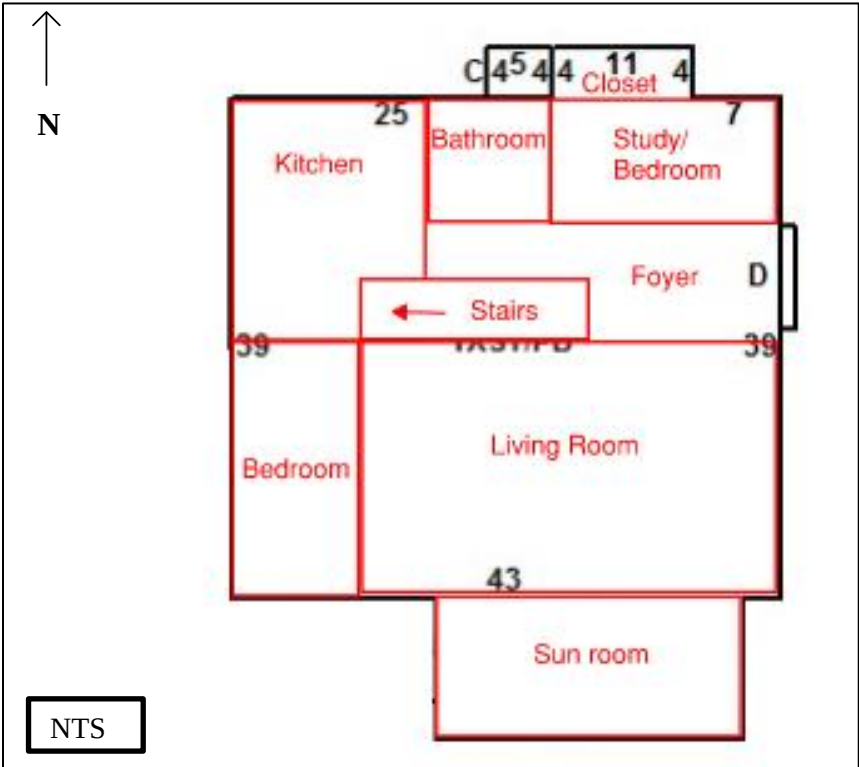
First Floorplan of 136 Jones Franklin Road, 2024
